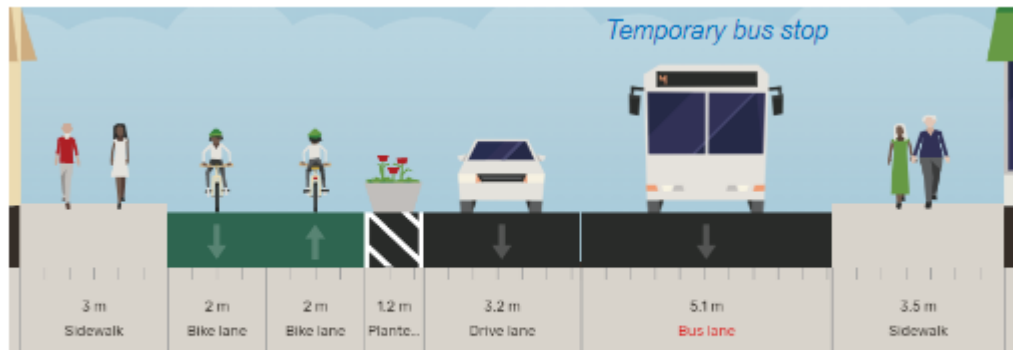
NS-2UA/3UB/3BA Cross section E (looking south)
